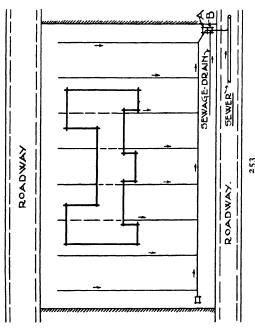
Plan of subsoil drains discharging into sewage drain.
